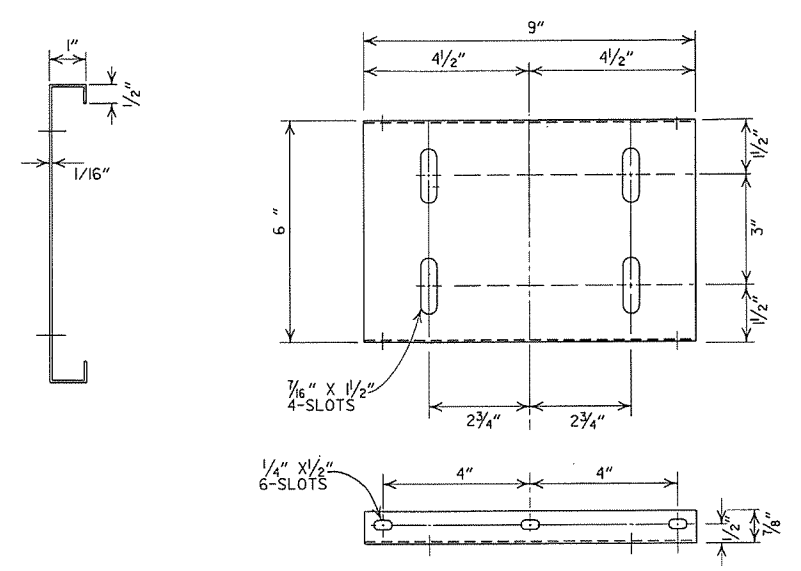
DETAIL OF TERMINAL ANCHOR POST (TYPE I)
